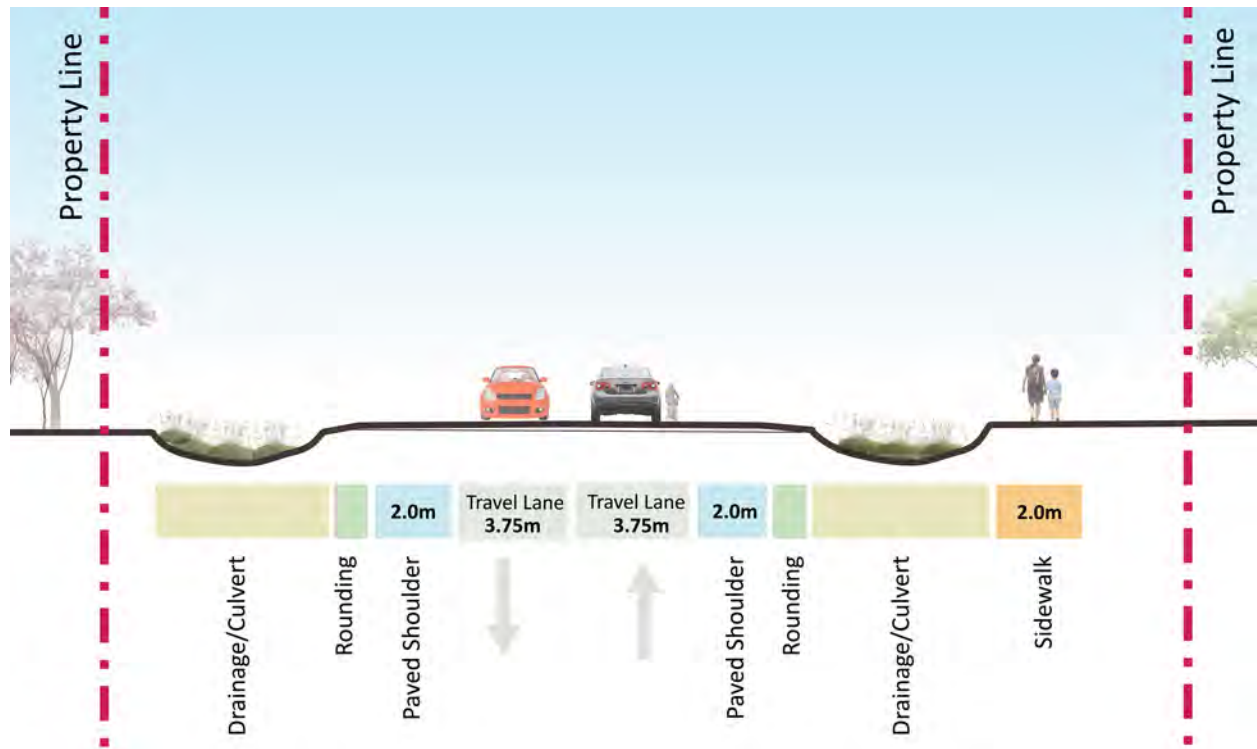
Existing Casablanca Boulevard Cross Section (south of Livingston Avenue)
